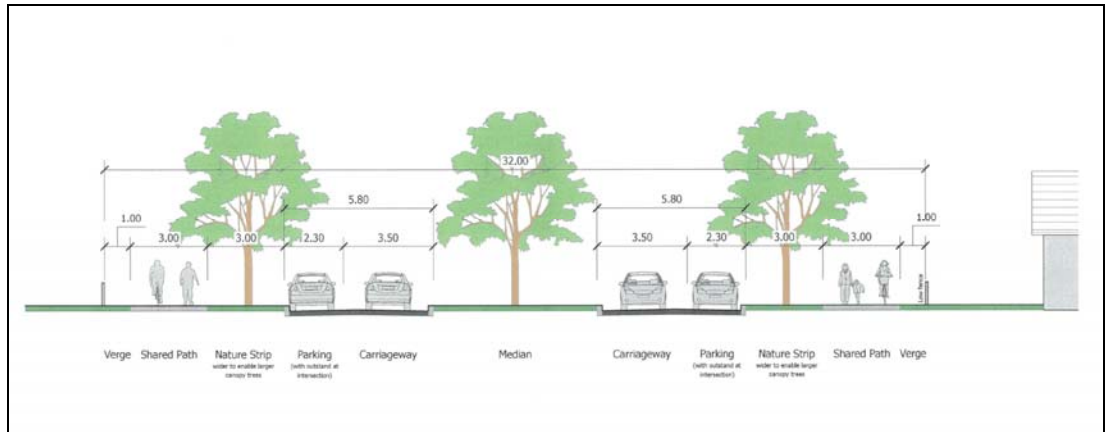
Ballarto Road 32m Boulevard Connector Cross Section
